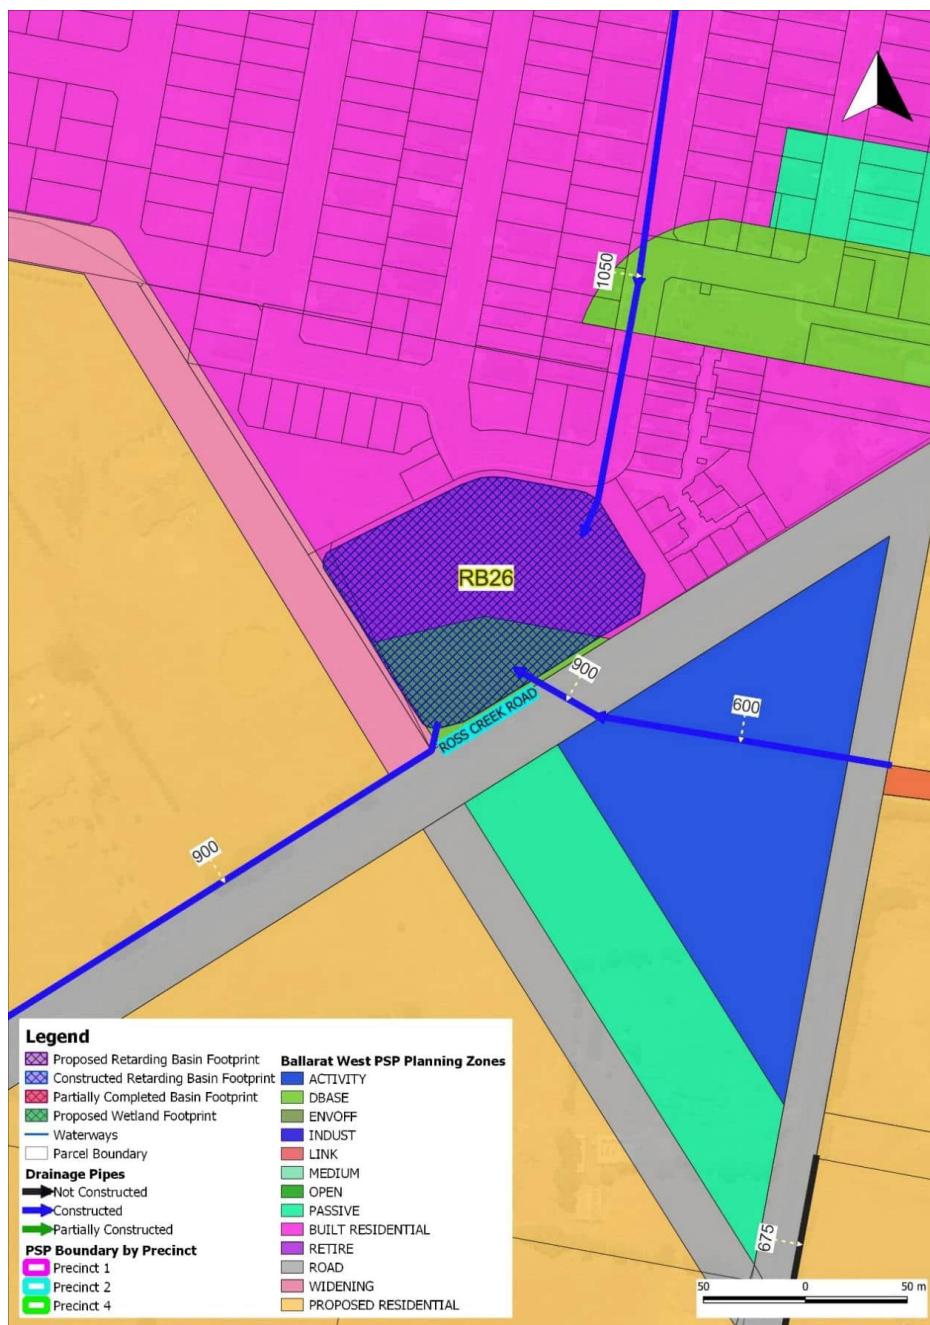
RETARDING BASIN 26 LAYOUT
